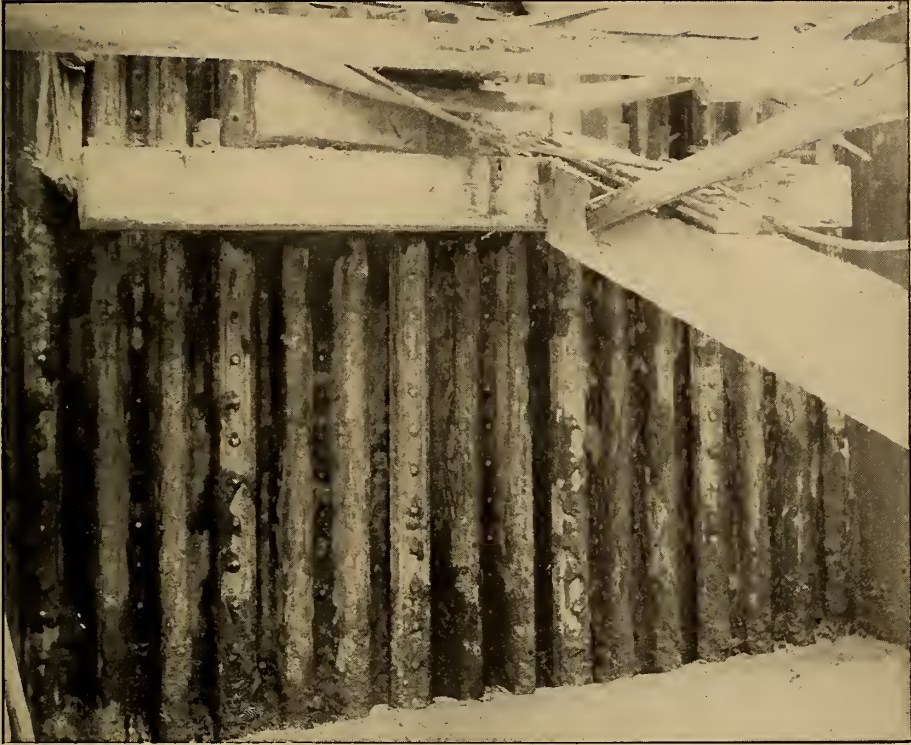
FOUNDATIONS OF NATIONAL CITY BANK, NEW YORK CITY. VIEW SHOWING WEMLINGER CORRUGATED SHEET PILING, AFTER EXCAVATION.
